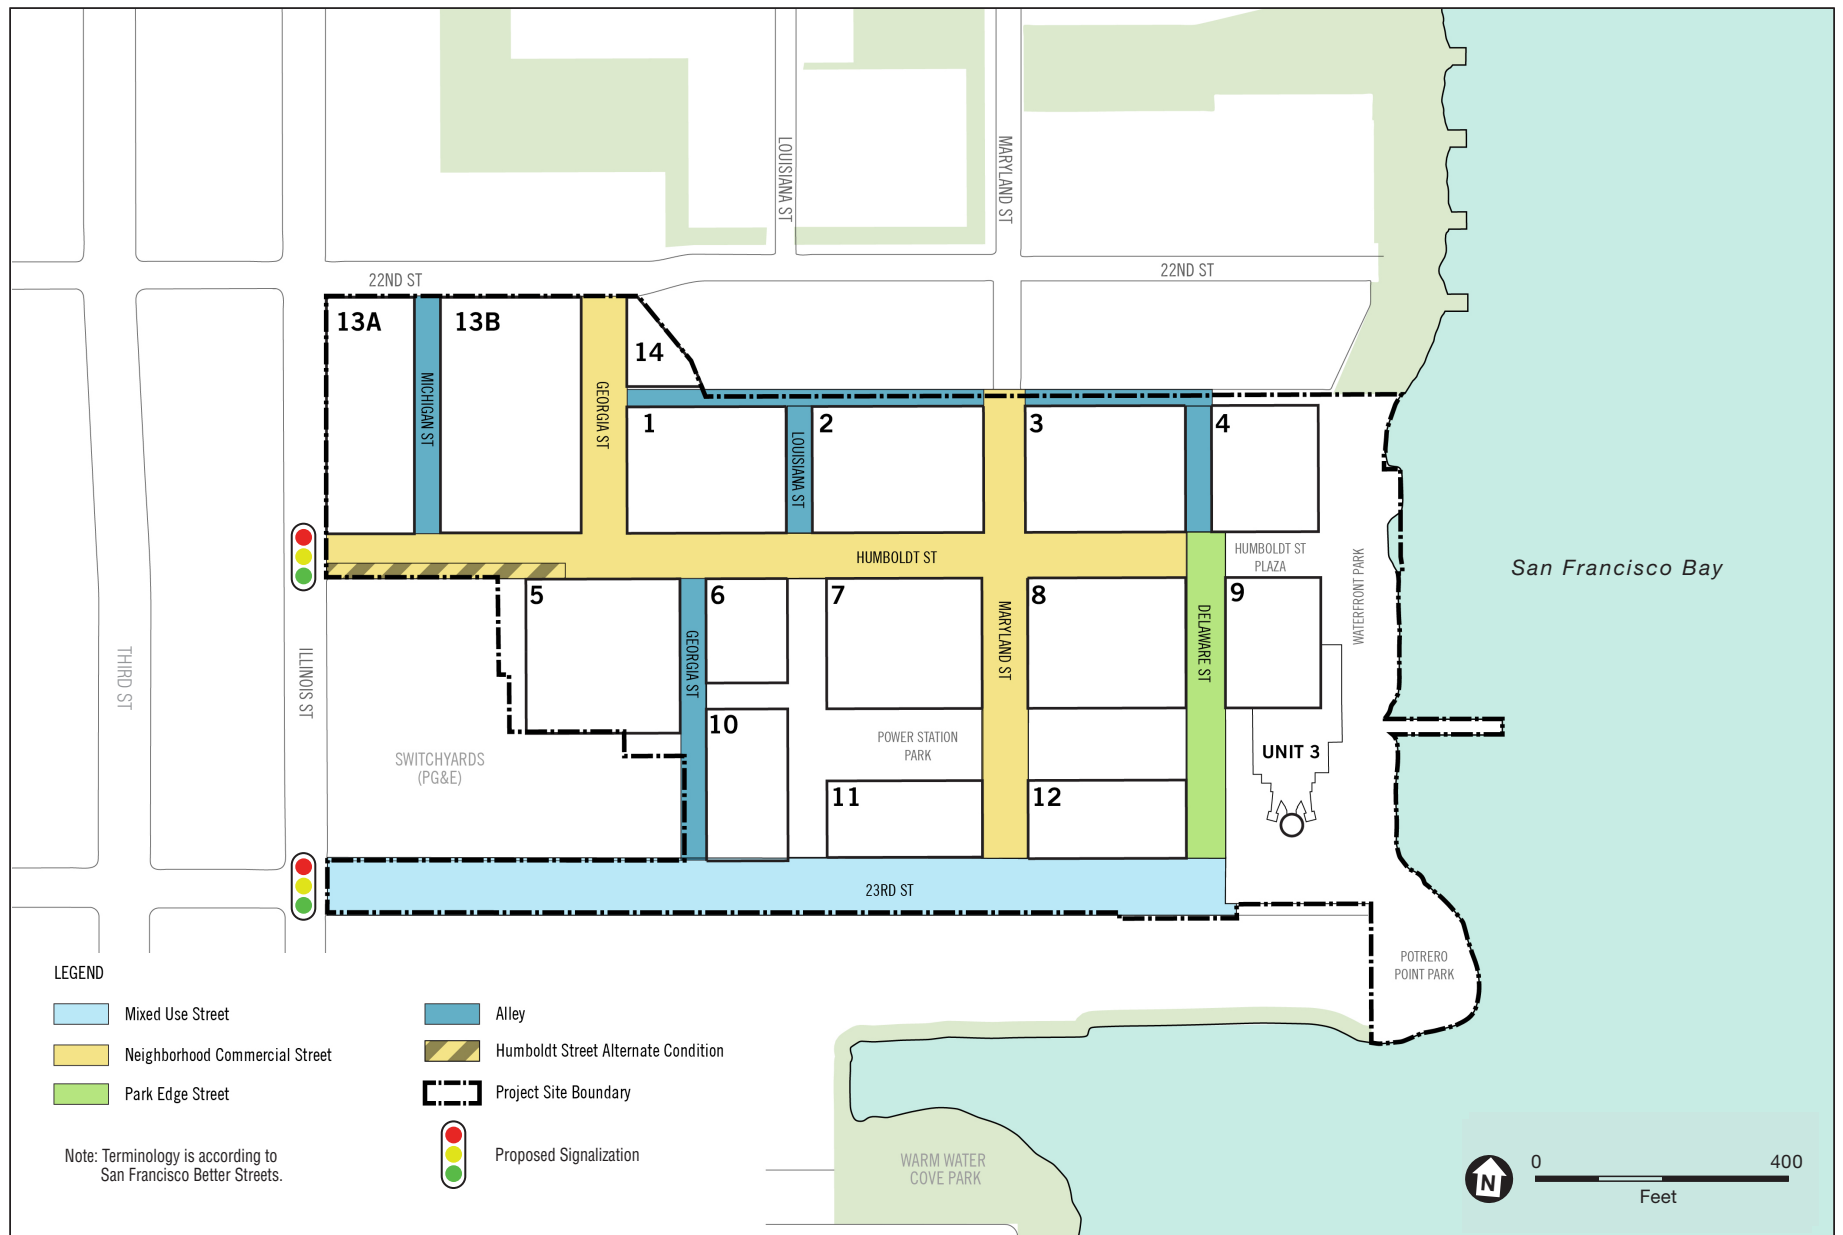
shows the proposed street plan. The north-south streets include Michigan, Georgia, Maryland, and Delaware Streets, which would connect the project site to 22nd Street; Georgia, Maryland, and Delaware Streets would connect to 23rd Street, although Georgia Street would be slightly offset at Humboldt Street before connecting to 23rd Street. East-west streets include Humboldt and 23rd Streets, which would connect
